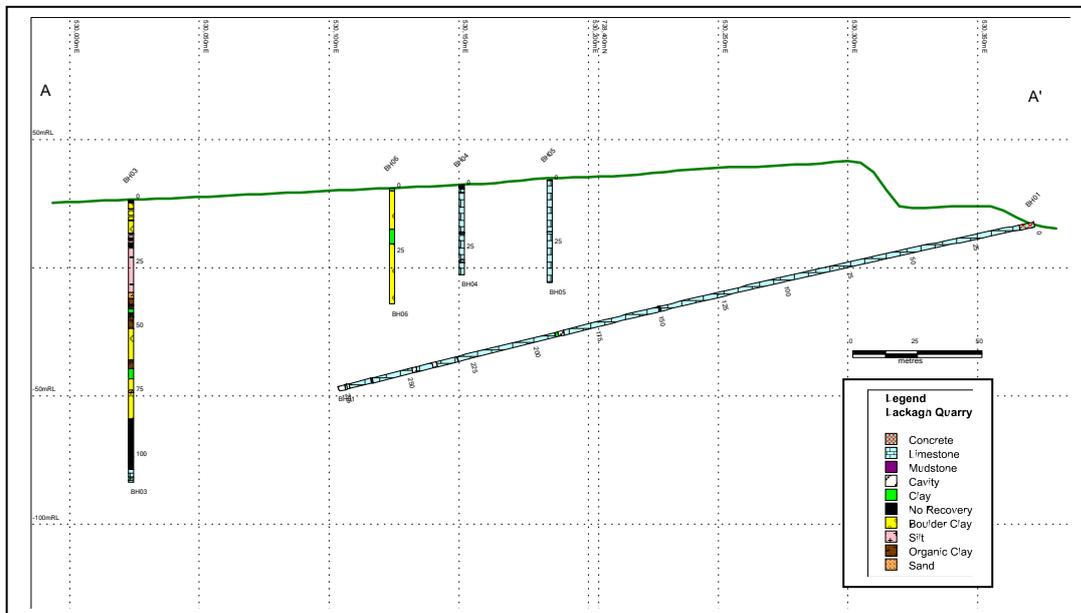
A - A' Drill Section (looking North) through the Lackagh Quarry GI Site
